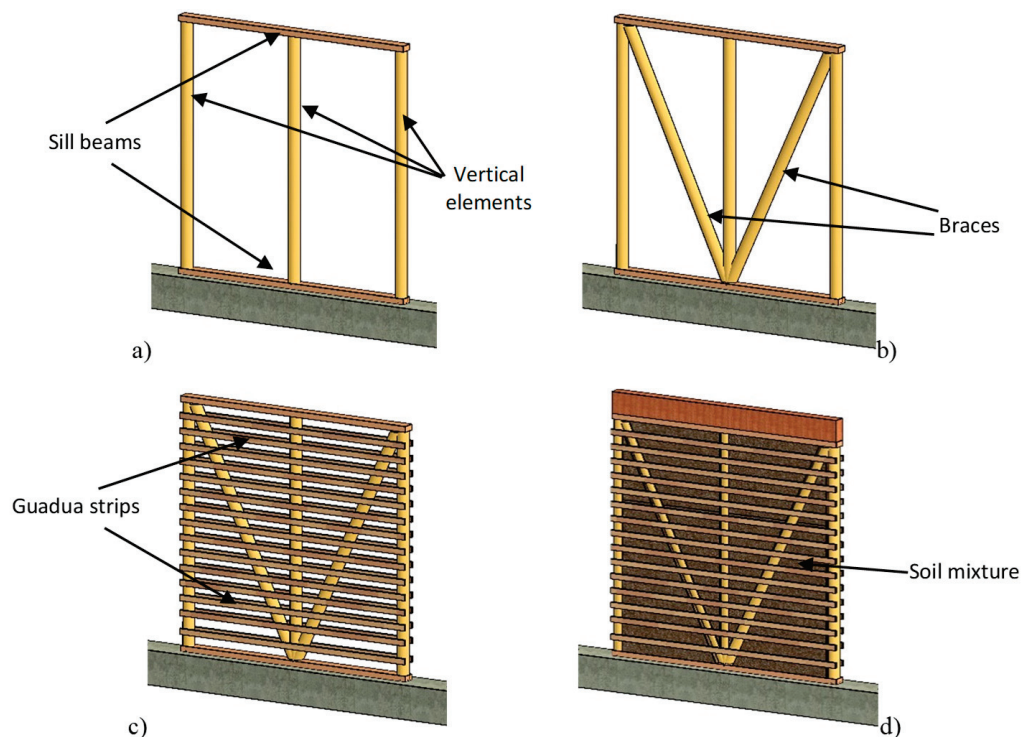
The construction process of a Colombian bahareque module. (a) The configuration of the wood/guadua frame, with sill wood beams and vertical elements (guadua or wood). (b) The placement of structural braces (guadua or wood). (c) The installation of guadua bamboo strips. (d) Infill of the wall with soil mixture.
